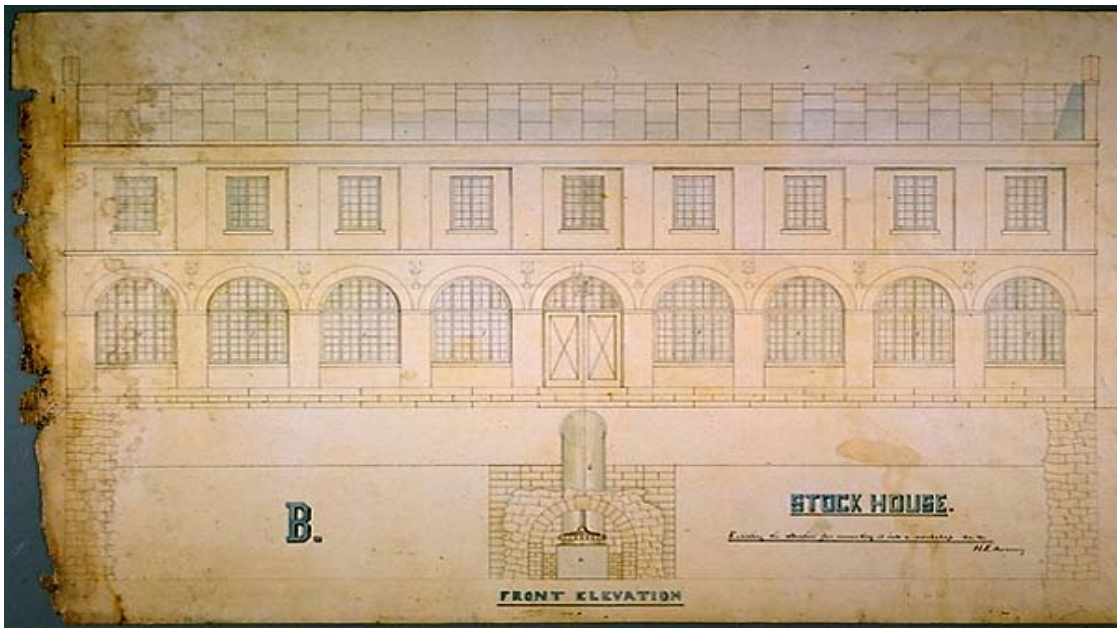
The architectural style of the newly transformed armory is illustrated by this James Burton drawing of the front elevation of the Stock House showing the proposed alterations for converting it into a workshop. NPS Collection.
